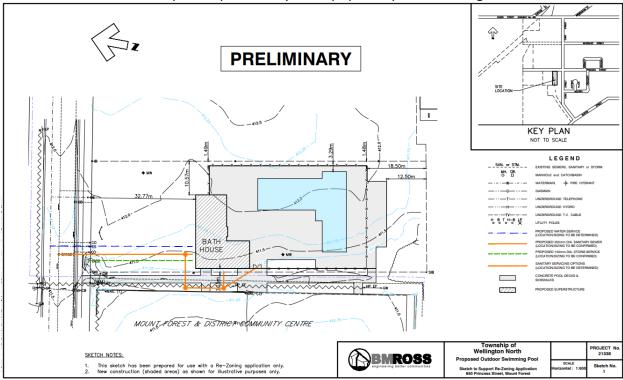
Site Plan sketch submitted by BMROSS., December 2024
